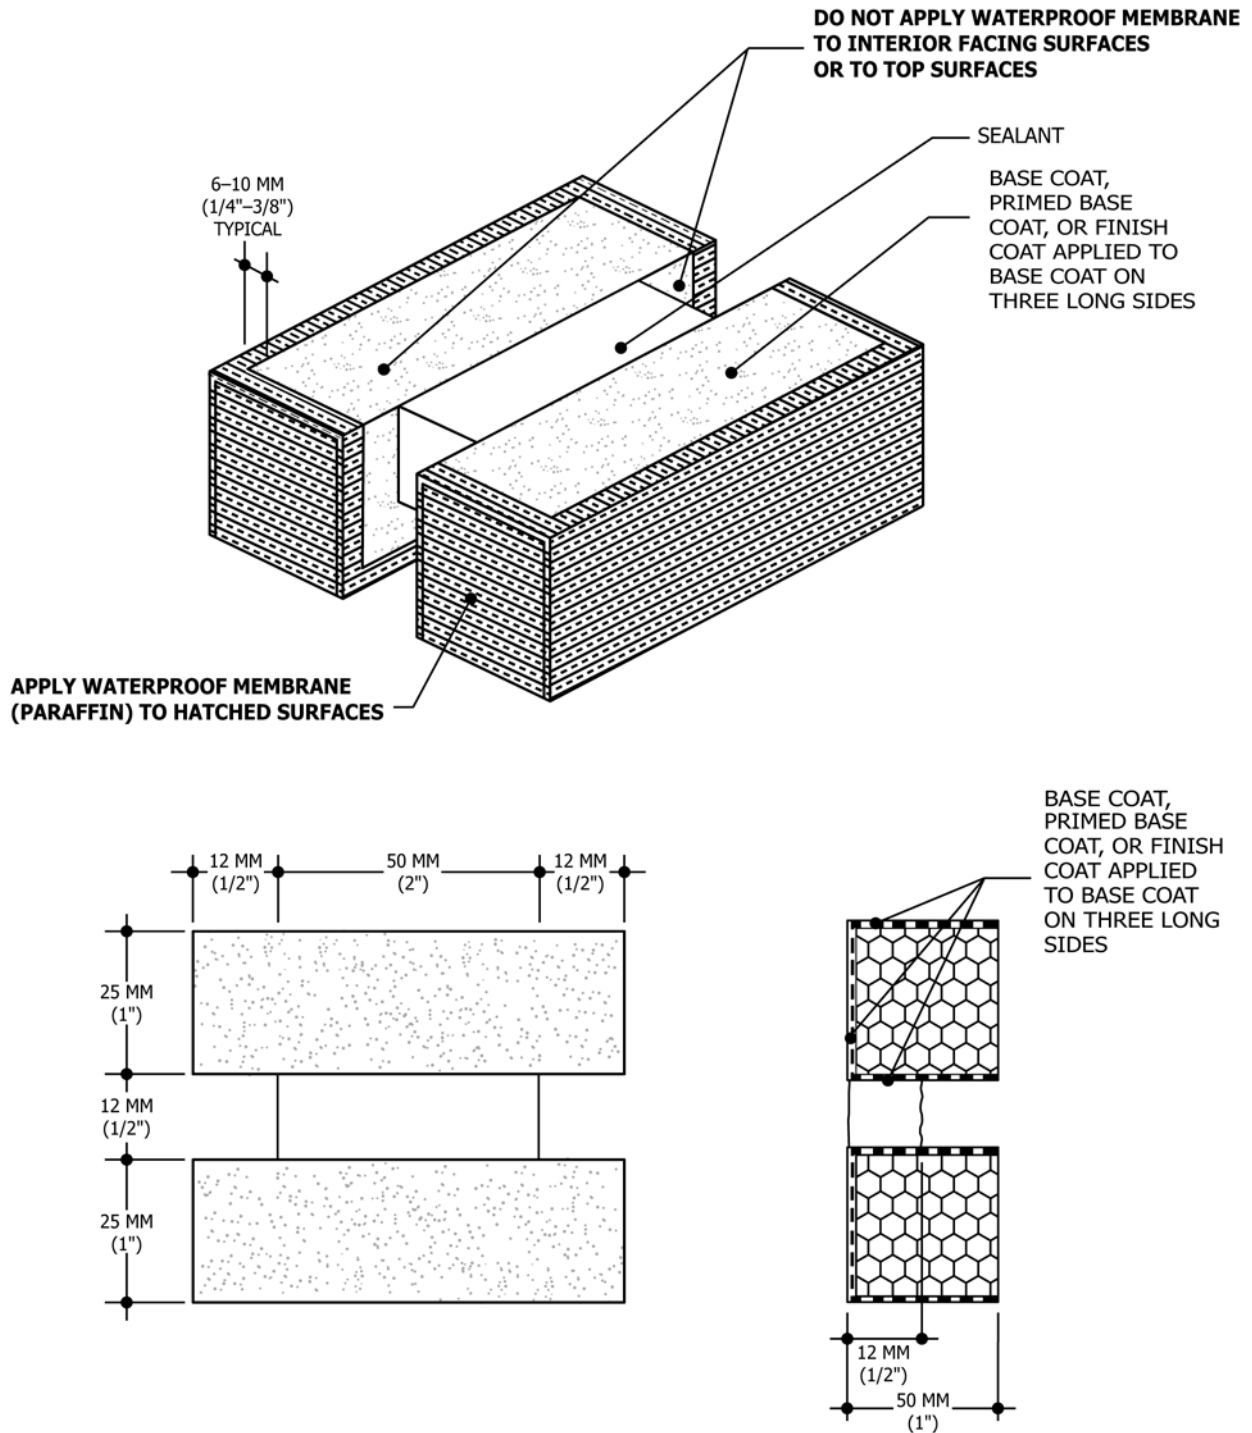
Test Specimen Assembly of Water Immersion Samples
